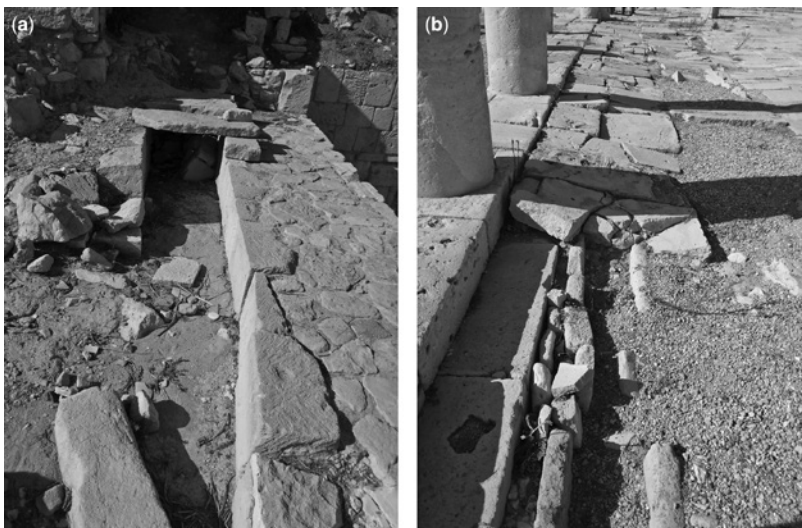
(a) Stone channel collecting storm water and (b) Under-floor drainage ditch (with permission of P. Azina).
